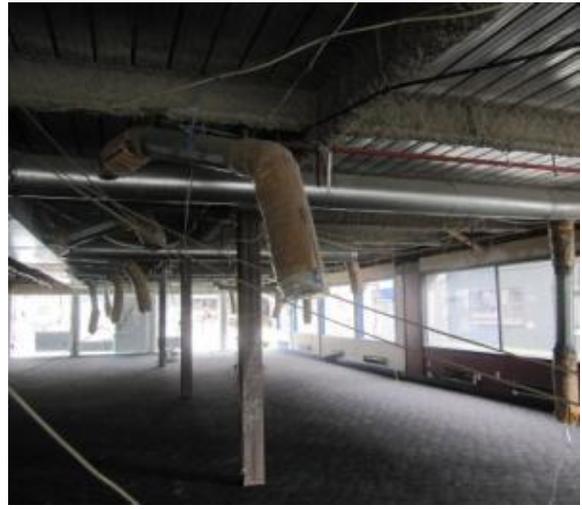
Eaton Place parking building. Punching shear failure in RC building.
